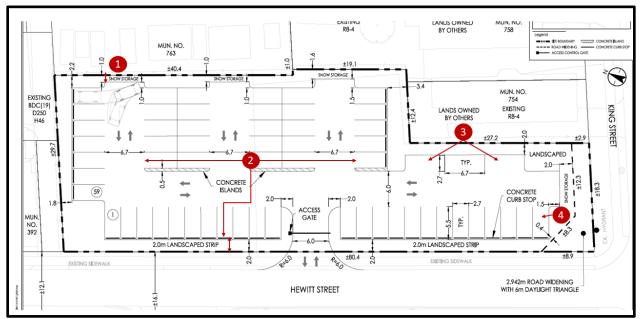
Site Concept Plan for proposed temporary surface parking lot on subject lands, with denoted issues.
